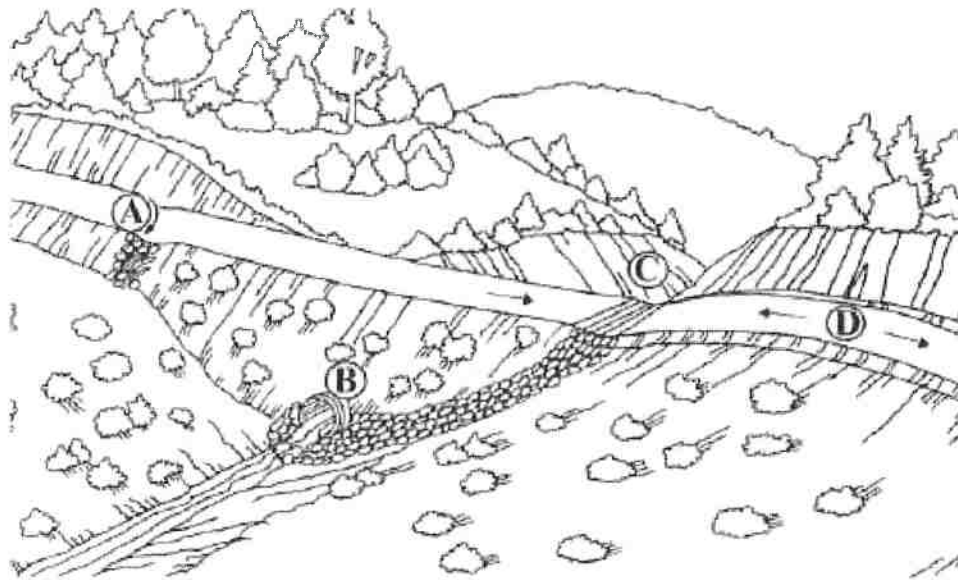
Critical dips or dipped crossing fills should be centered near a stream crossing's down-road hingeline, not over the centerline of the crossing where overtopping could cause washout or severe erosion of the fill. If the stream crossing culvert (B) plugs, water will pond behind the fill until reaching the critical dip or low point in the crossing (C) and flowing back down into the natural stream channel. The down-road ditch must be plugged to prevent streamflow from diverting down the ditch line. For extra protection in this sketch, uprap armor has been placed at the critical dip outfall and extending downslope to the stream channel. This is only required or suggested on stream crossings where the culvert is highly likely to plug and the crossing fill overtopped. The dip at the hinge line is usually sufficient to limit erosional damage during an overtopping event. Road surface and ditch runoff is disconnected from the stream crossing by installing a rolling dip and ditch relief culvert just up-road from the crossing (A) (Keller and Sherar, 2003).
